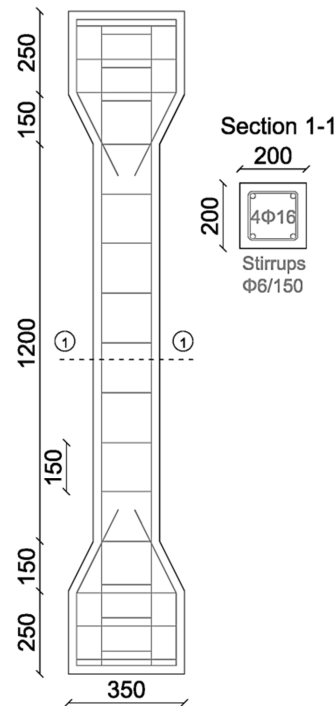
Scheme of columns type 2 (dimensions in mm)
